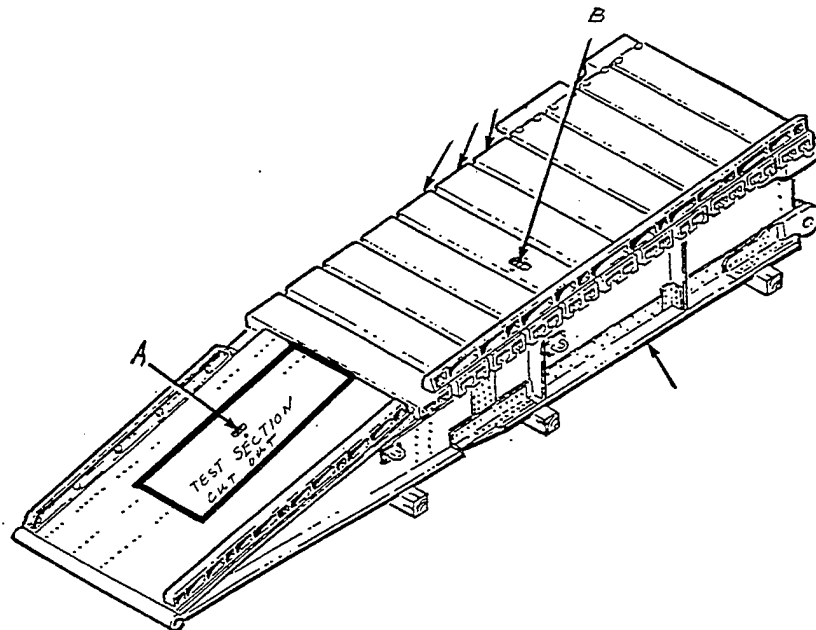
Sketch of the AVL B end panel assembly showing the location of the large test section cut from the lower ramp end with respect to the location of the lifting bar at point A.
